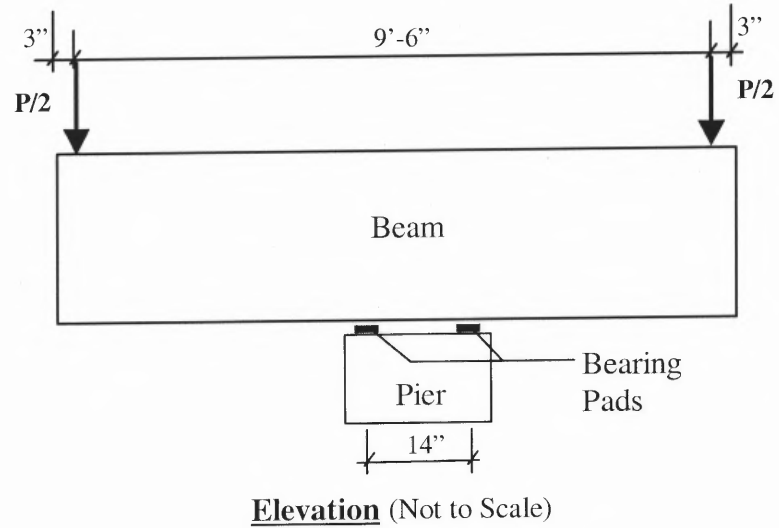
Test setup of beams 1, 2, 1R and 2D.
